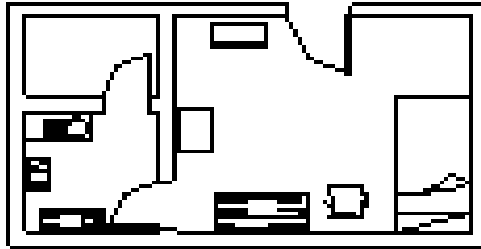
Photos of an apartment in the first floor plan of Rubat Al maghribi
